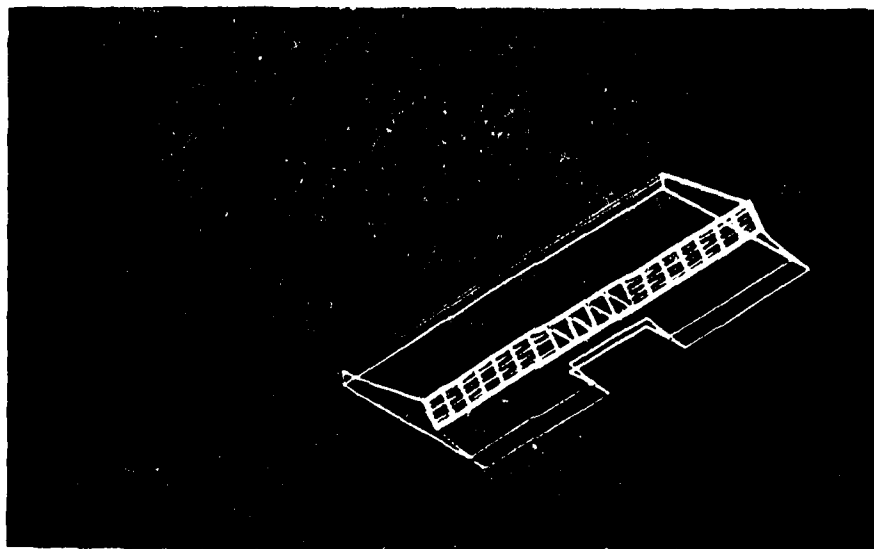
Roof section laid out in SKETCH and extruded. Louver windows and solar collection panels are built in 2-dimensions and placed on roof.
